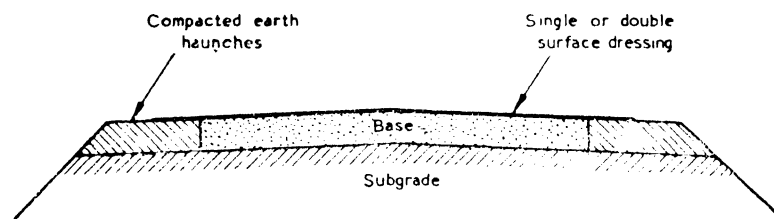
SECTION OF TYPICAL SOIL ROAD FOR USE AS A
